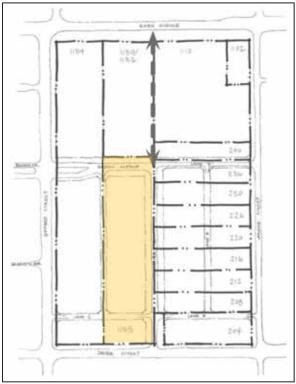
Advance Street Plan Area #2 (existing property lines shown in heavy black, while future property lines shown in light black – subject site is highlighted).
